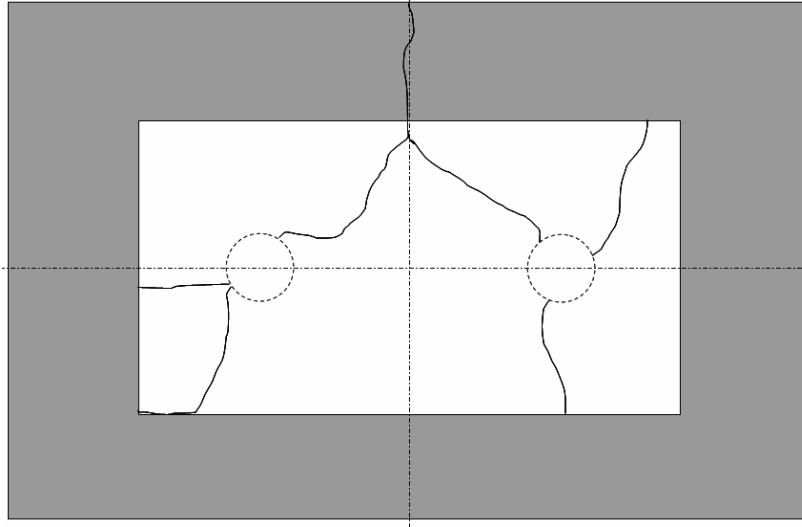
Crack Pattern at the Bottom Surface of S1-13.
